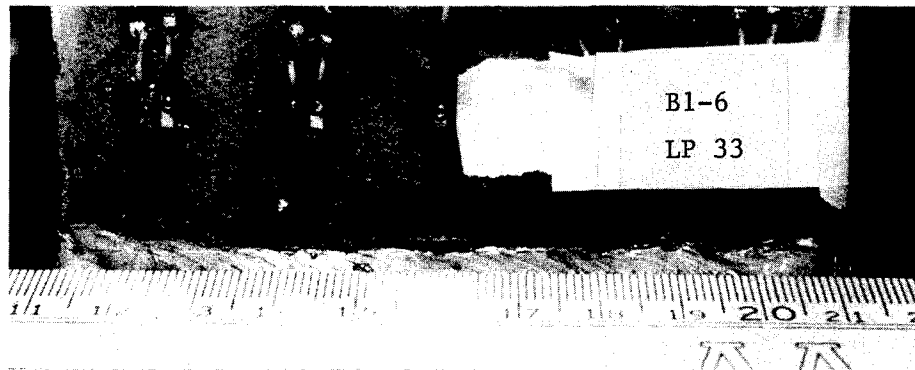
Cracks at Weld Toe and Coping
